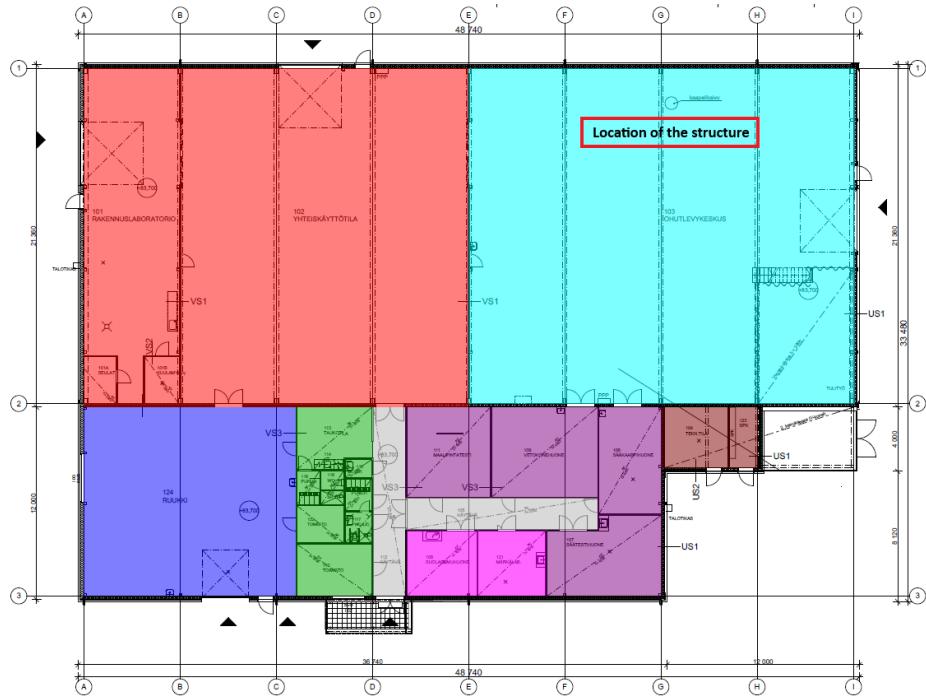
First floor area plan of Hamk Tech laboratory with planned location of the frame.
